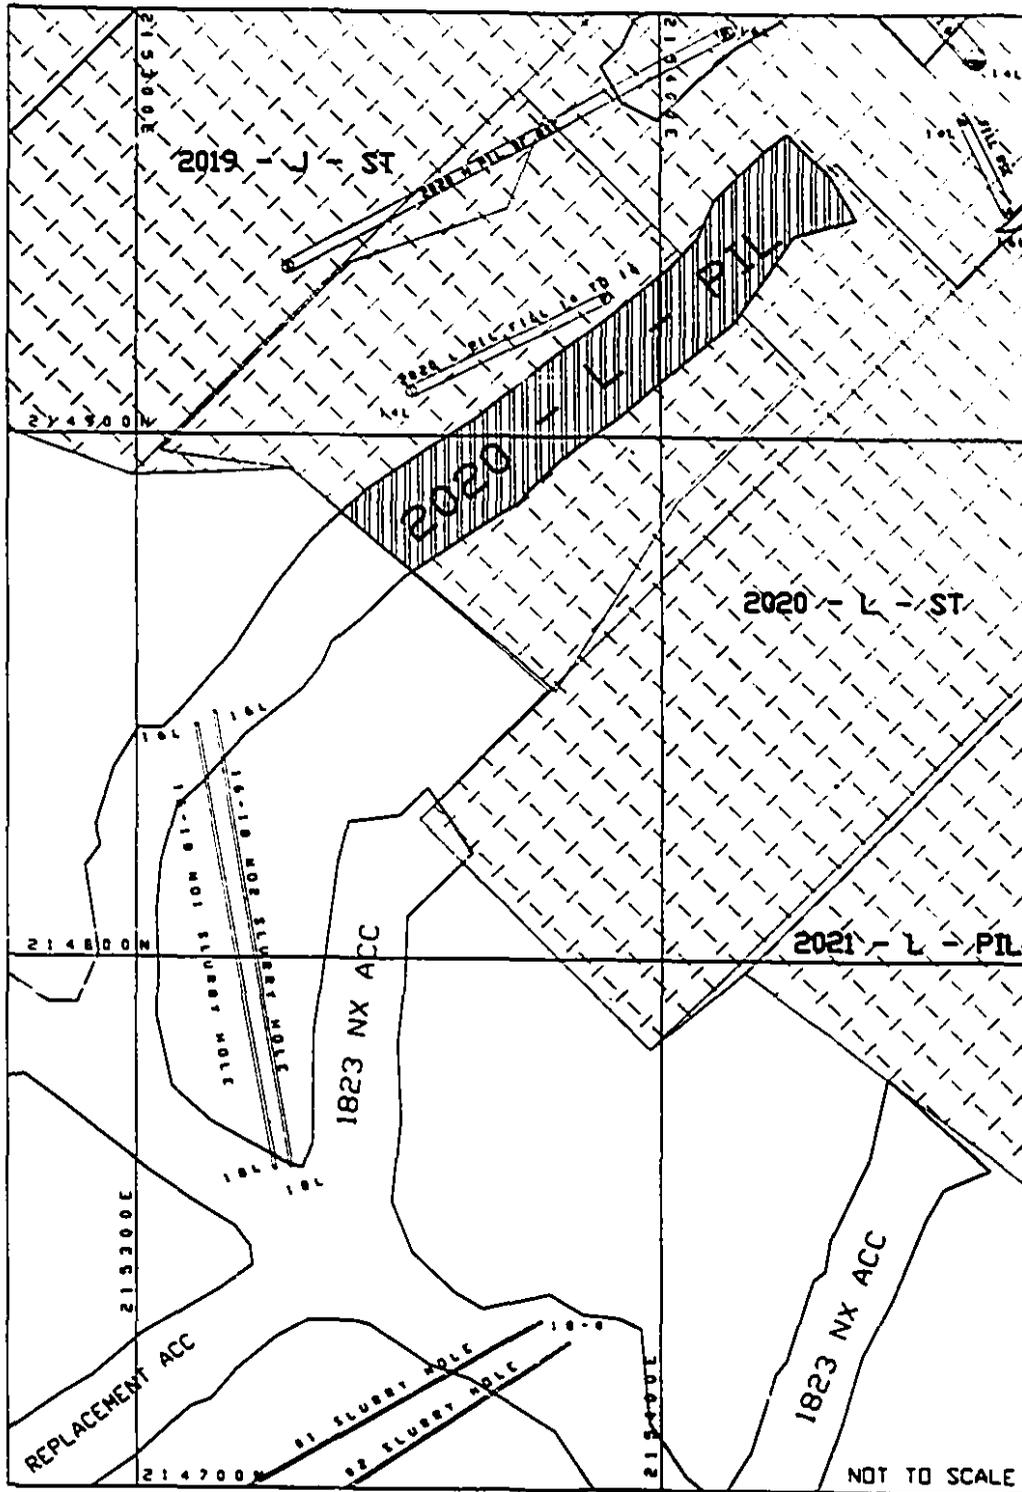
LEVEL PLAN SHOWING 2020-L-PIL ROADHEADER DRIFT
